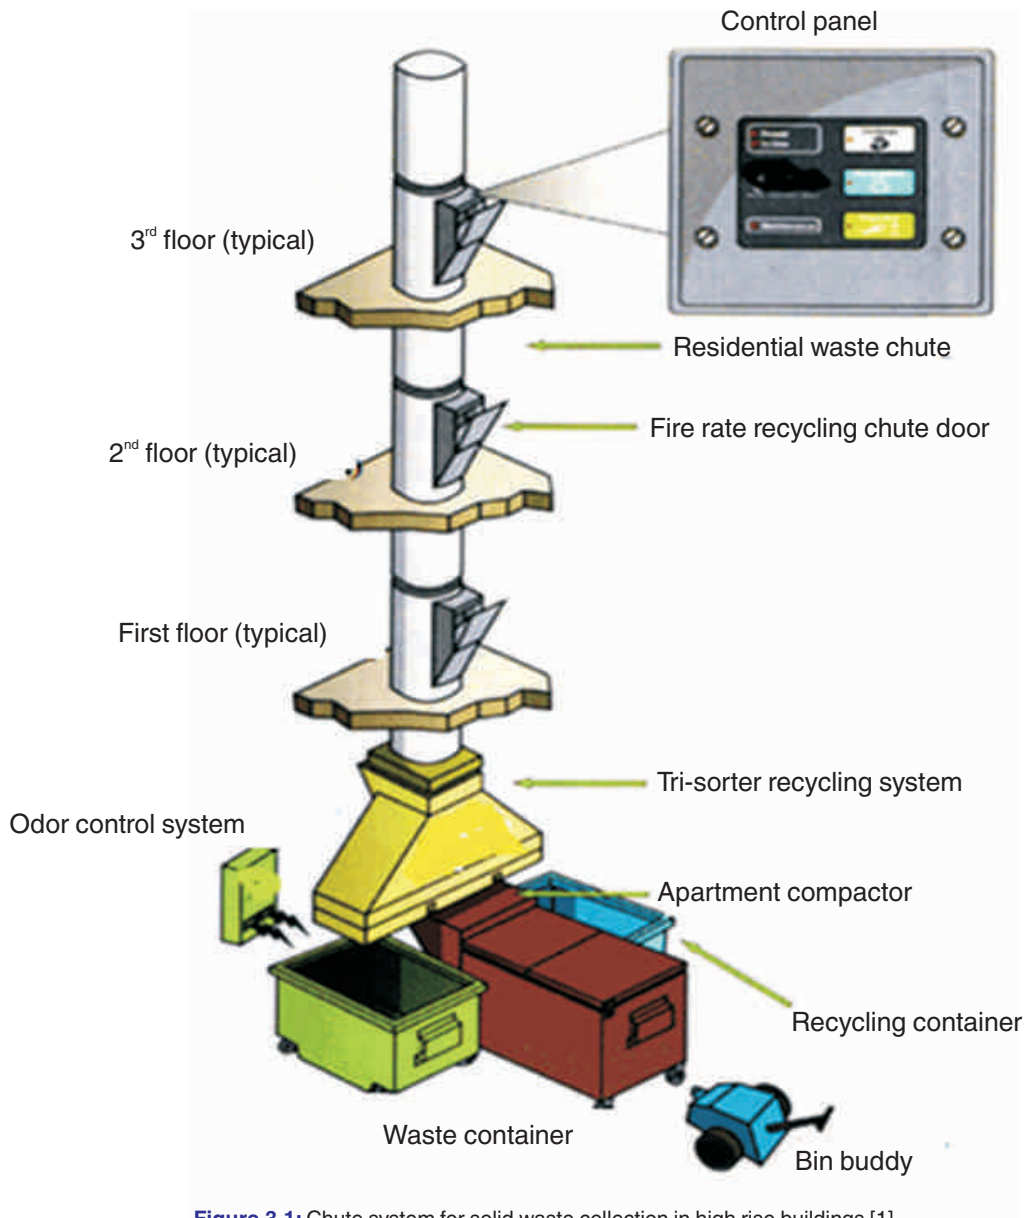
Chute system for solid waste collection in high rise buildings [1]
